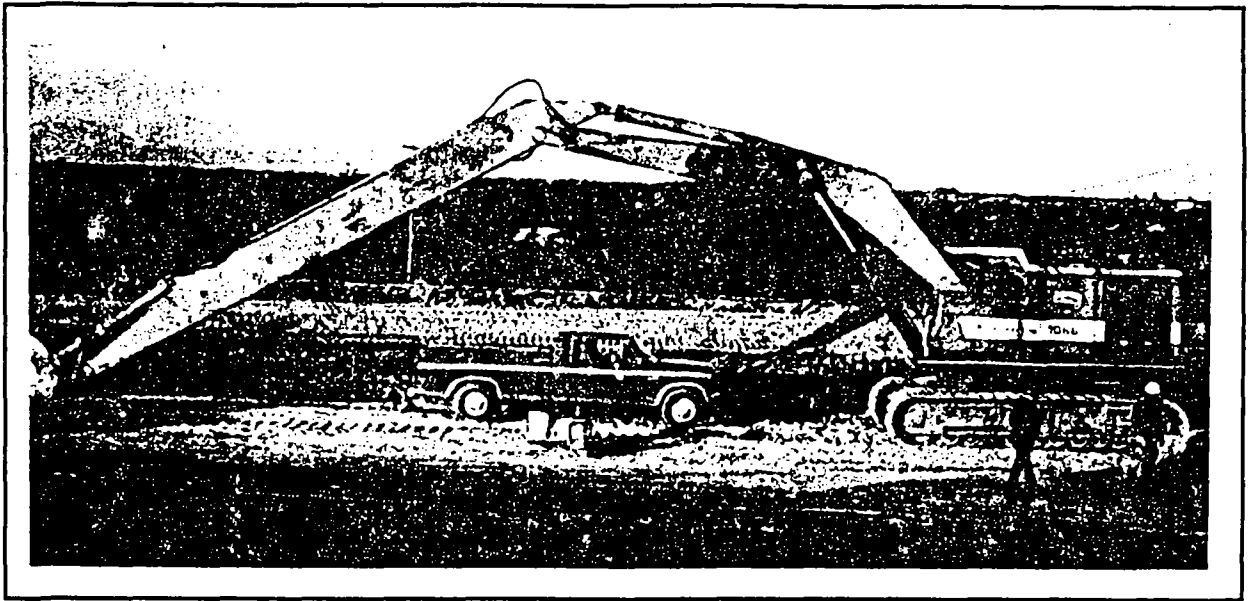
Backhoe for Excavating Slurry Trench.
